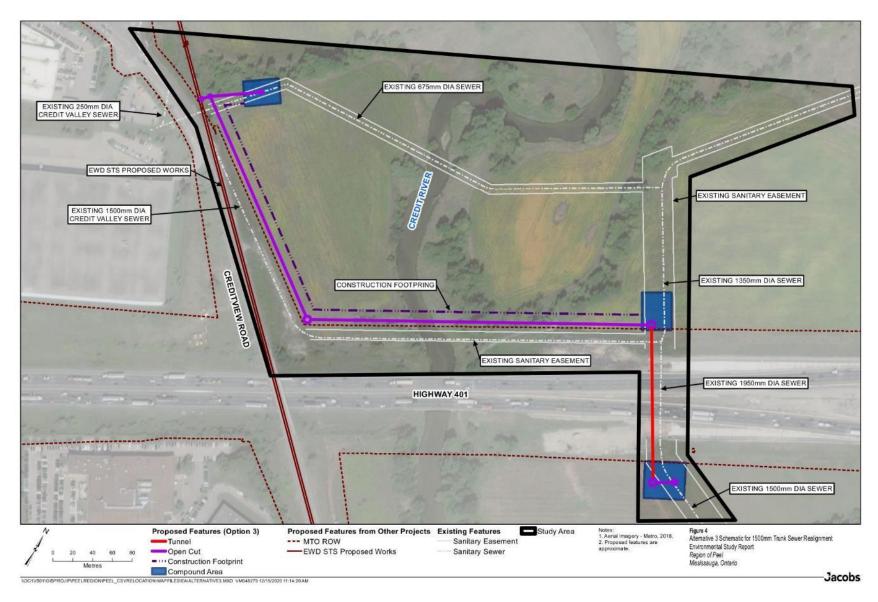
Alternative No. 3: 600 m Open-Cut and 155 m Tunnel for Highway 401 Crossing
